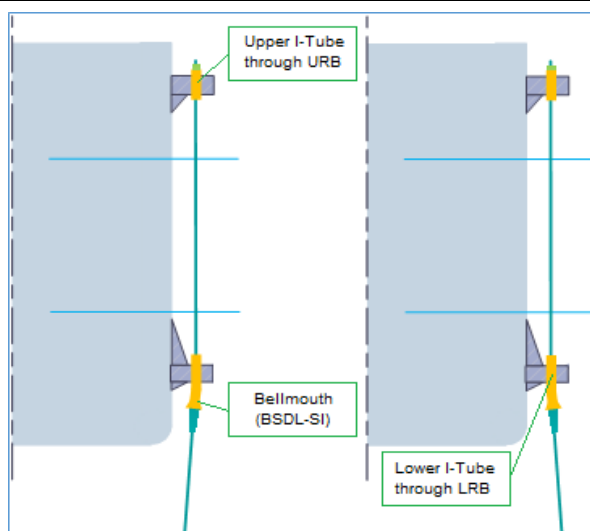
I-Tube Assembly with two I-Tube Sections.
